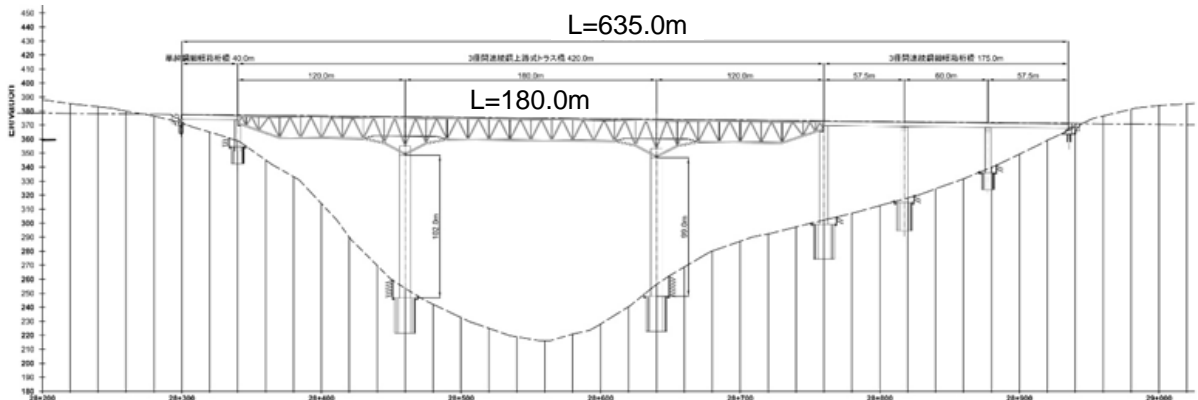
Long Span Bridge-1 (Steel Truss Type Bridge)
